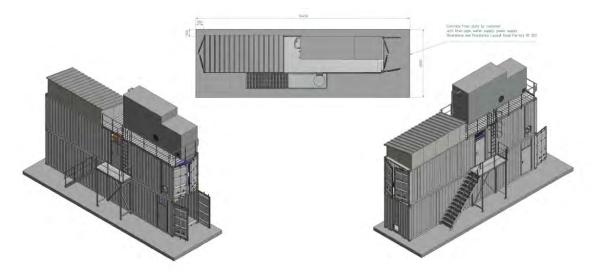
3D drawings and floor plan of the structure provided by TechnoAlpin
